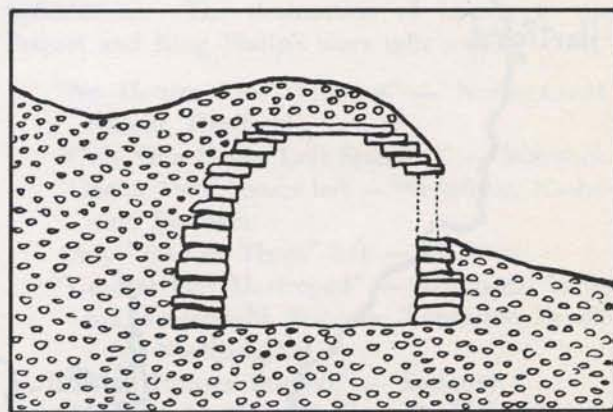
CROSS SECTION OF BEEHIVE, showing opening, corbelling, slope of ground, and hummock.
